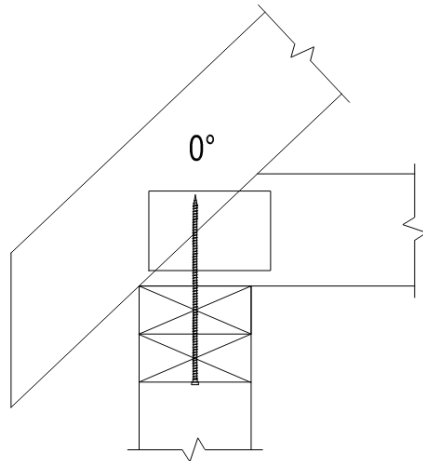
INSTALLATION OF FASTENERS IN DOUBLE TOP PLATE PERPENDICULAR TO TRUSS/RAFTER/JOIST APPLICATIONS
